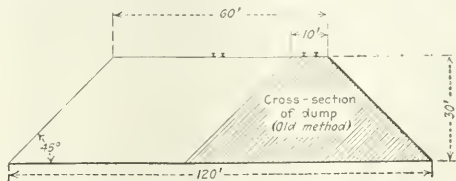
DUMP CROSS-SECTION, OLD AND NEW METHOD
